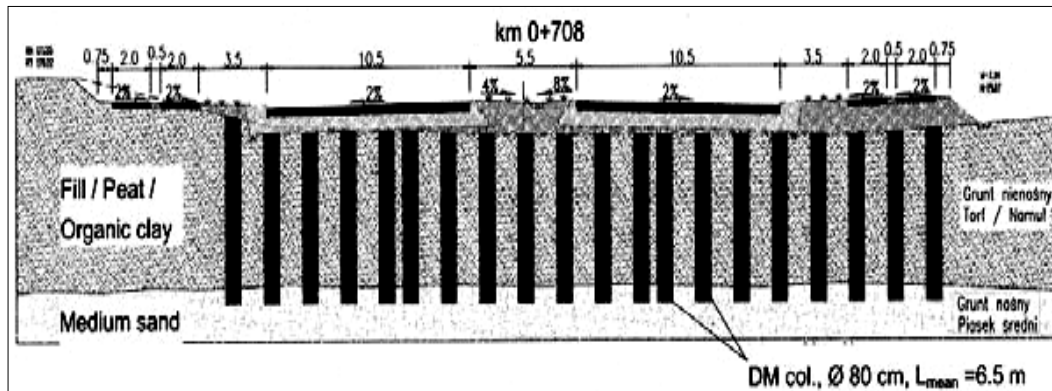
A cross section of the pavement with deep soil mixing process. (Shahidul, 2018)
